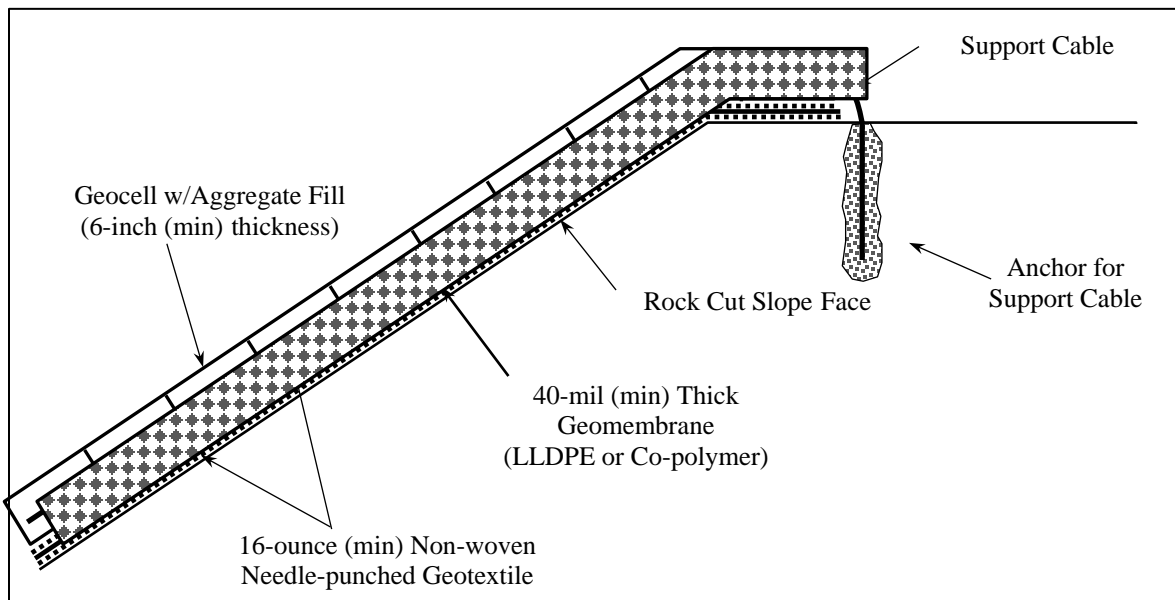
Conceptual Detail for Isolation of Rock Cut with Slope Face Flatter than 1H:1V and Steeper than 2H:1V – (Condition B)
